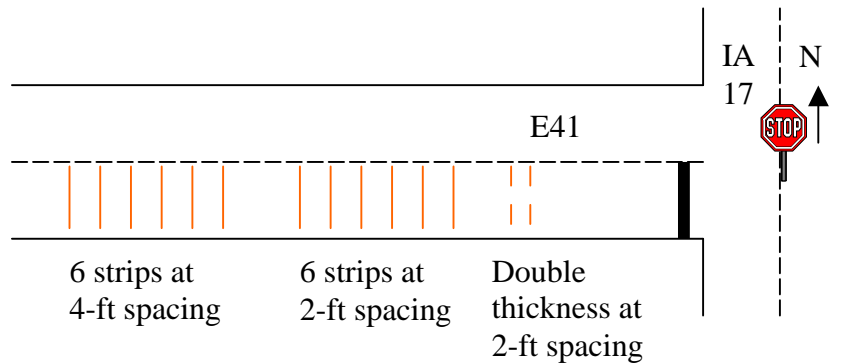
Rumble strips layouts – IA 17 and E41– Site B (concrete pavement).
